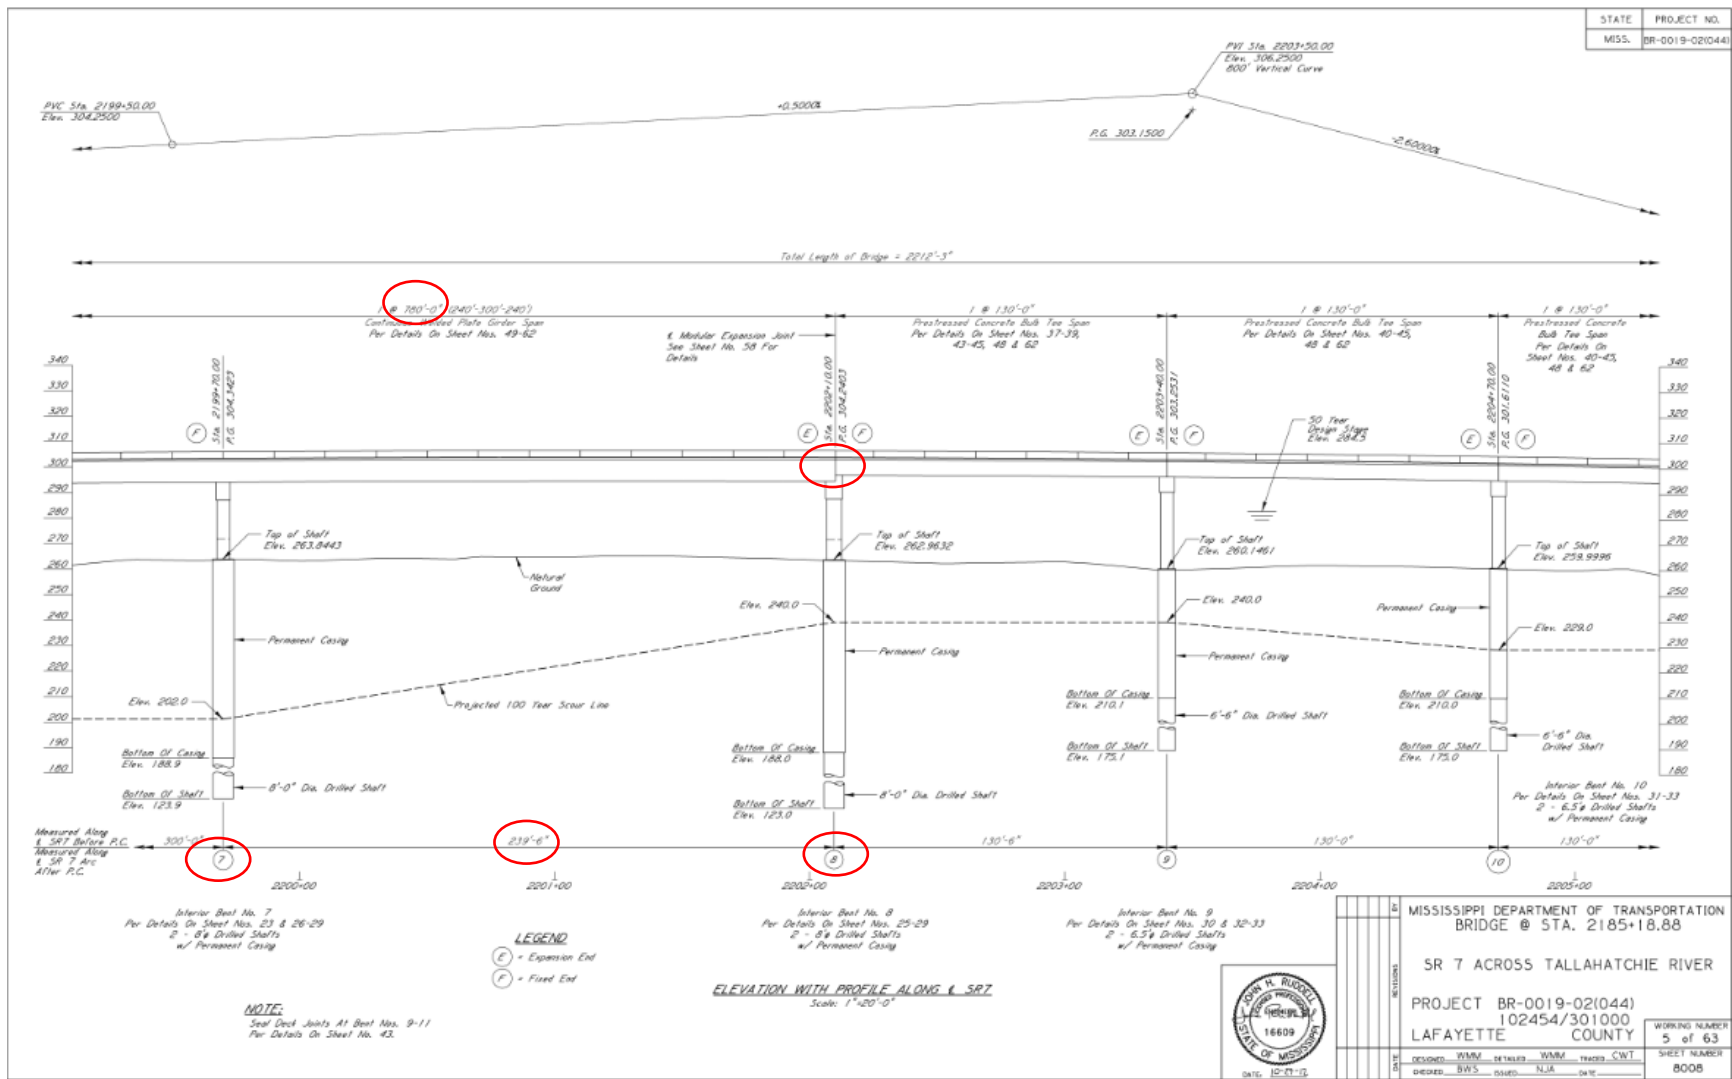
End of 780 ft steel-girder supported over Piers 7 and 8
